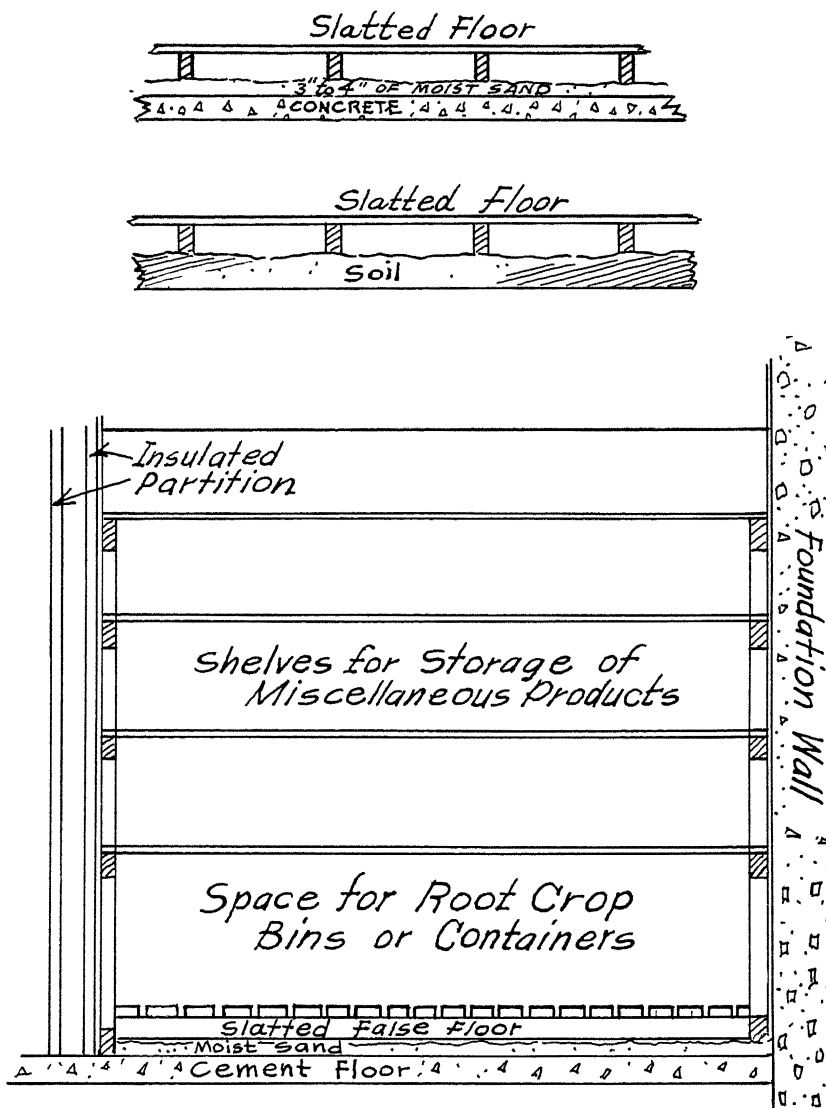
Diagram of sidewall shelving in cellar storage. The slatted floor improves air circulation under stored products and helps secure proper conditions of humidity. The two illustrations at top show two methods of construction—one on a concrete floor, and the other on an earth floor.
